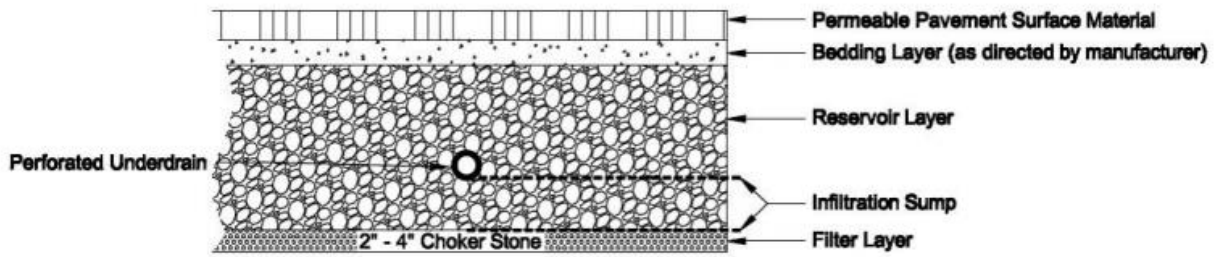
Cross section of an Enhanced permeable pavement design with underdrain⁵⁴³
